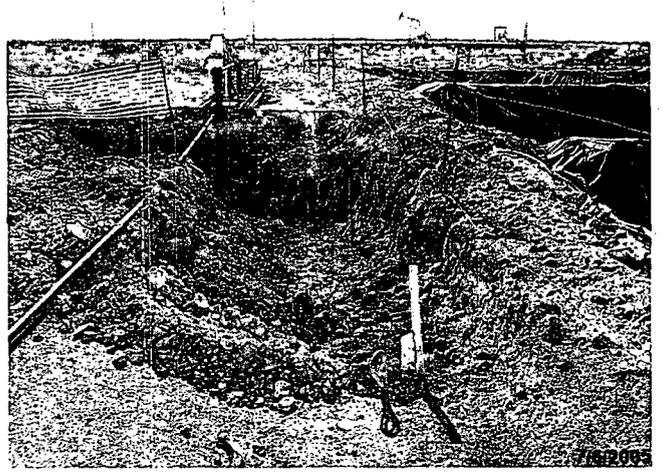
Looking westerly at excavation. Drilling pit is in right side of photo.
